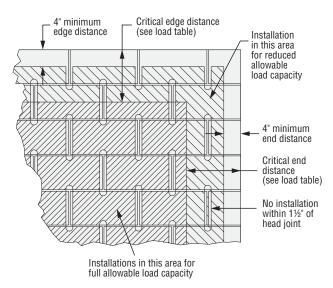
Allowable Anchor Placement in Grouted CMU Face Shell
